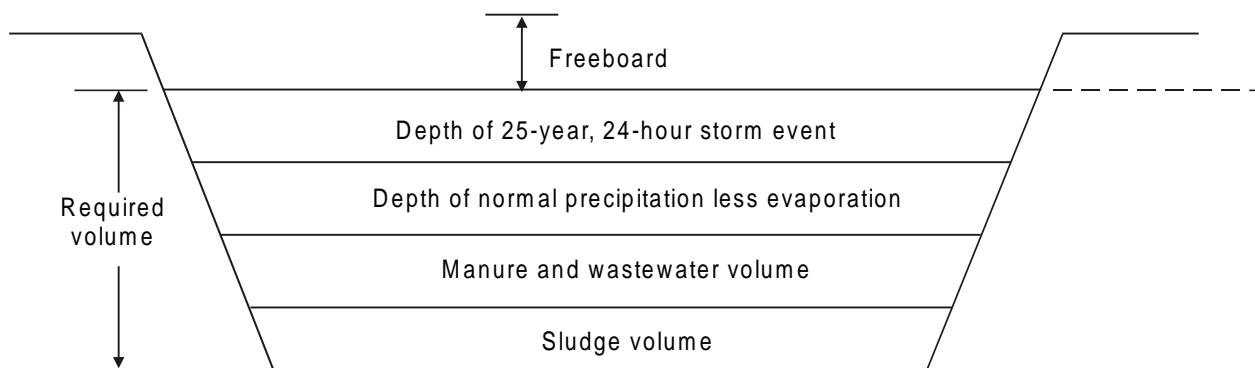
Cross Section of Waste Storage Pond (Source: USDA 1996)
